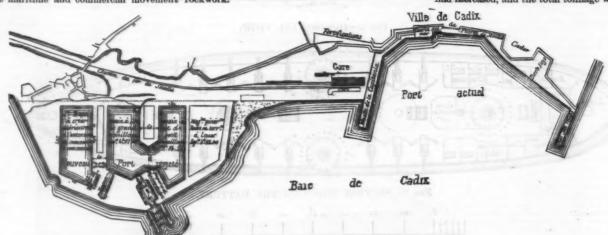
PORT OF CADIZ—PLAN OF FLOATING DOCKS.
